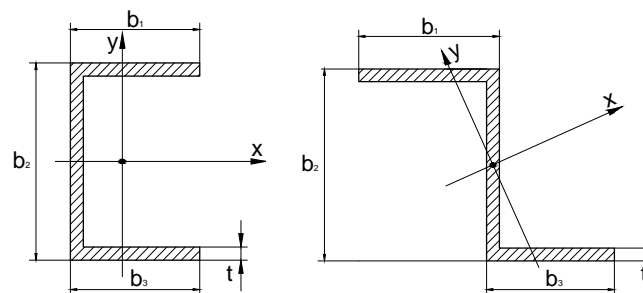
Cross-sections of U and Z profiles of the cantilever beam.
